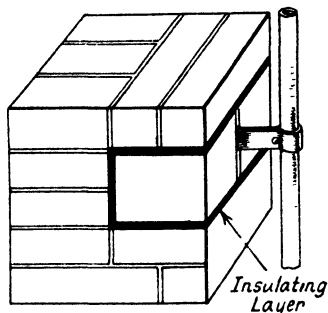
PIPE SUPPORTED BY INSULATED WALL BLOCK
